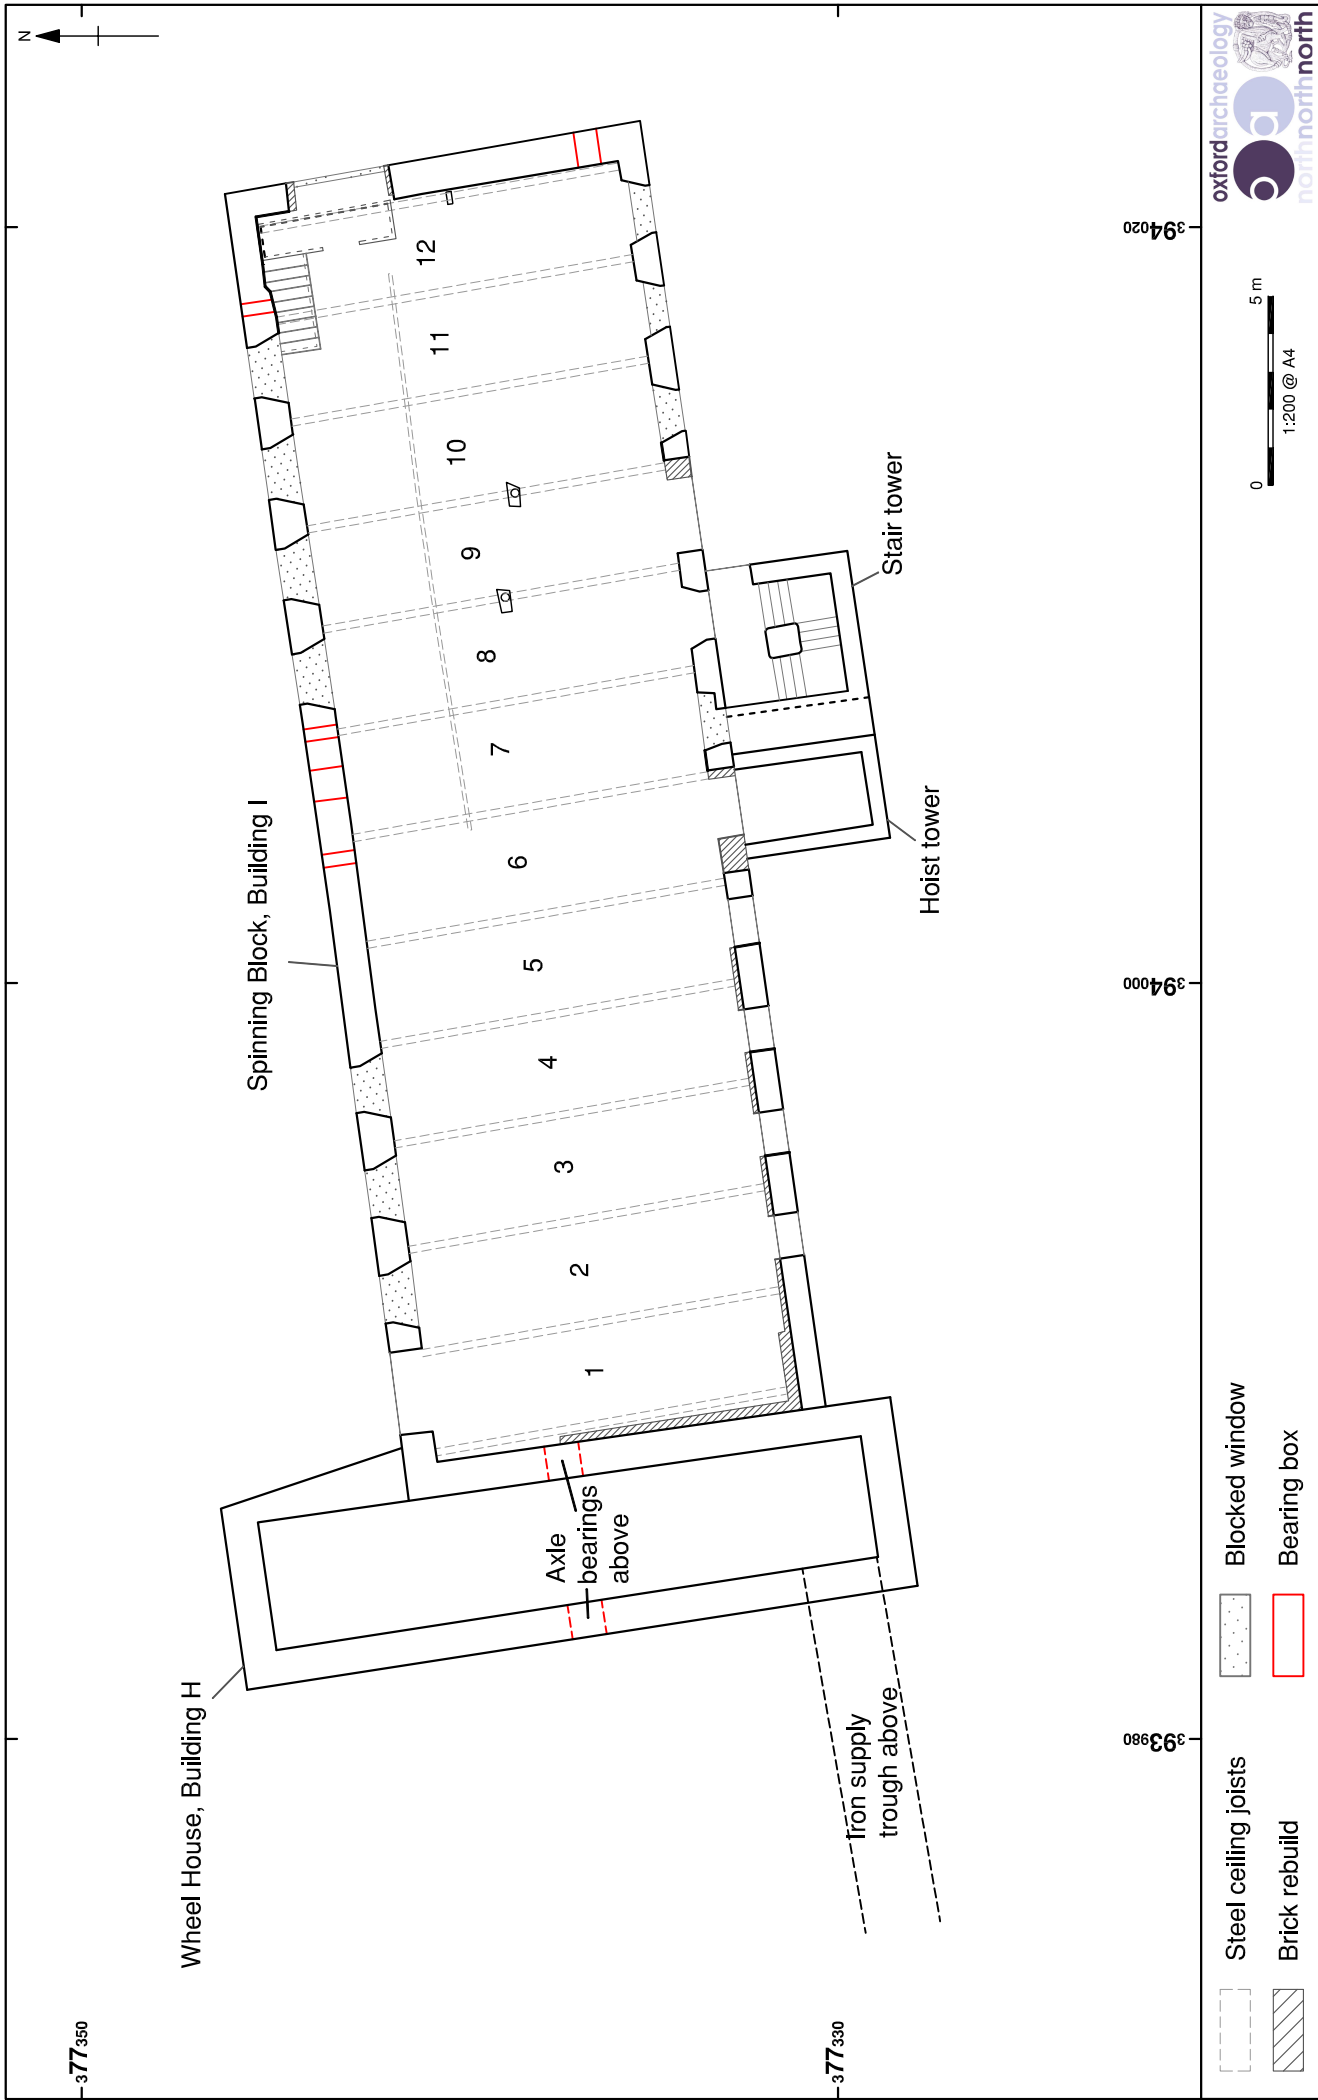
Plan of spinning block (Building I) and wheel house (Building H)
